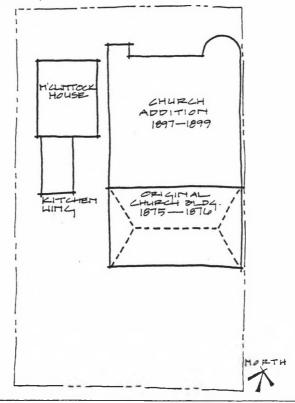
1875 Waterloo Baptist Church and 1897 Addition
